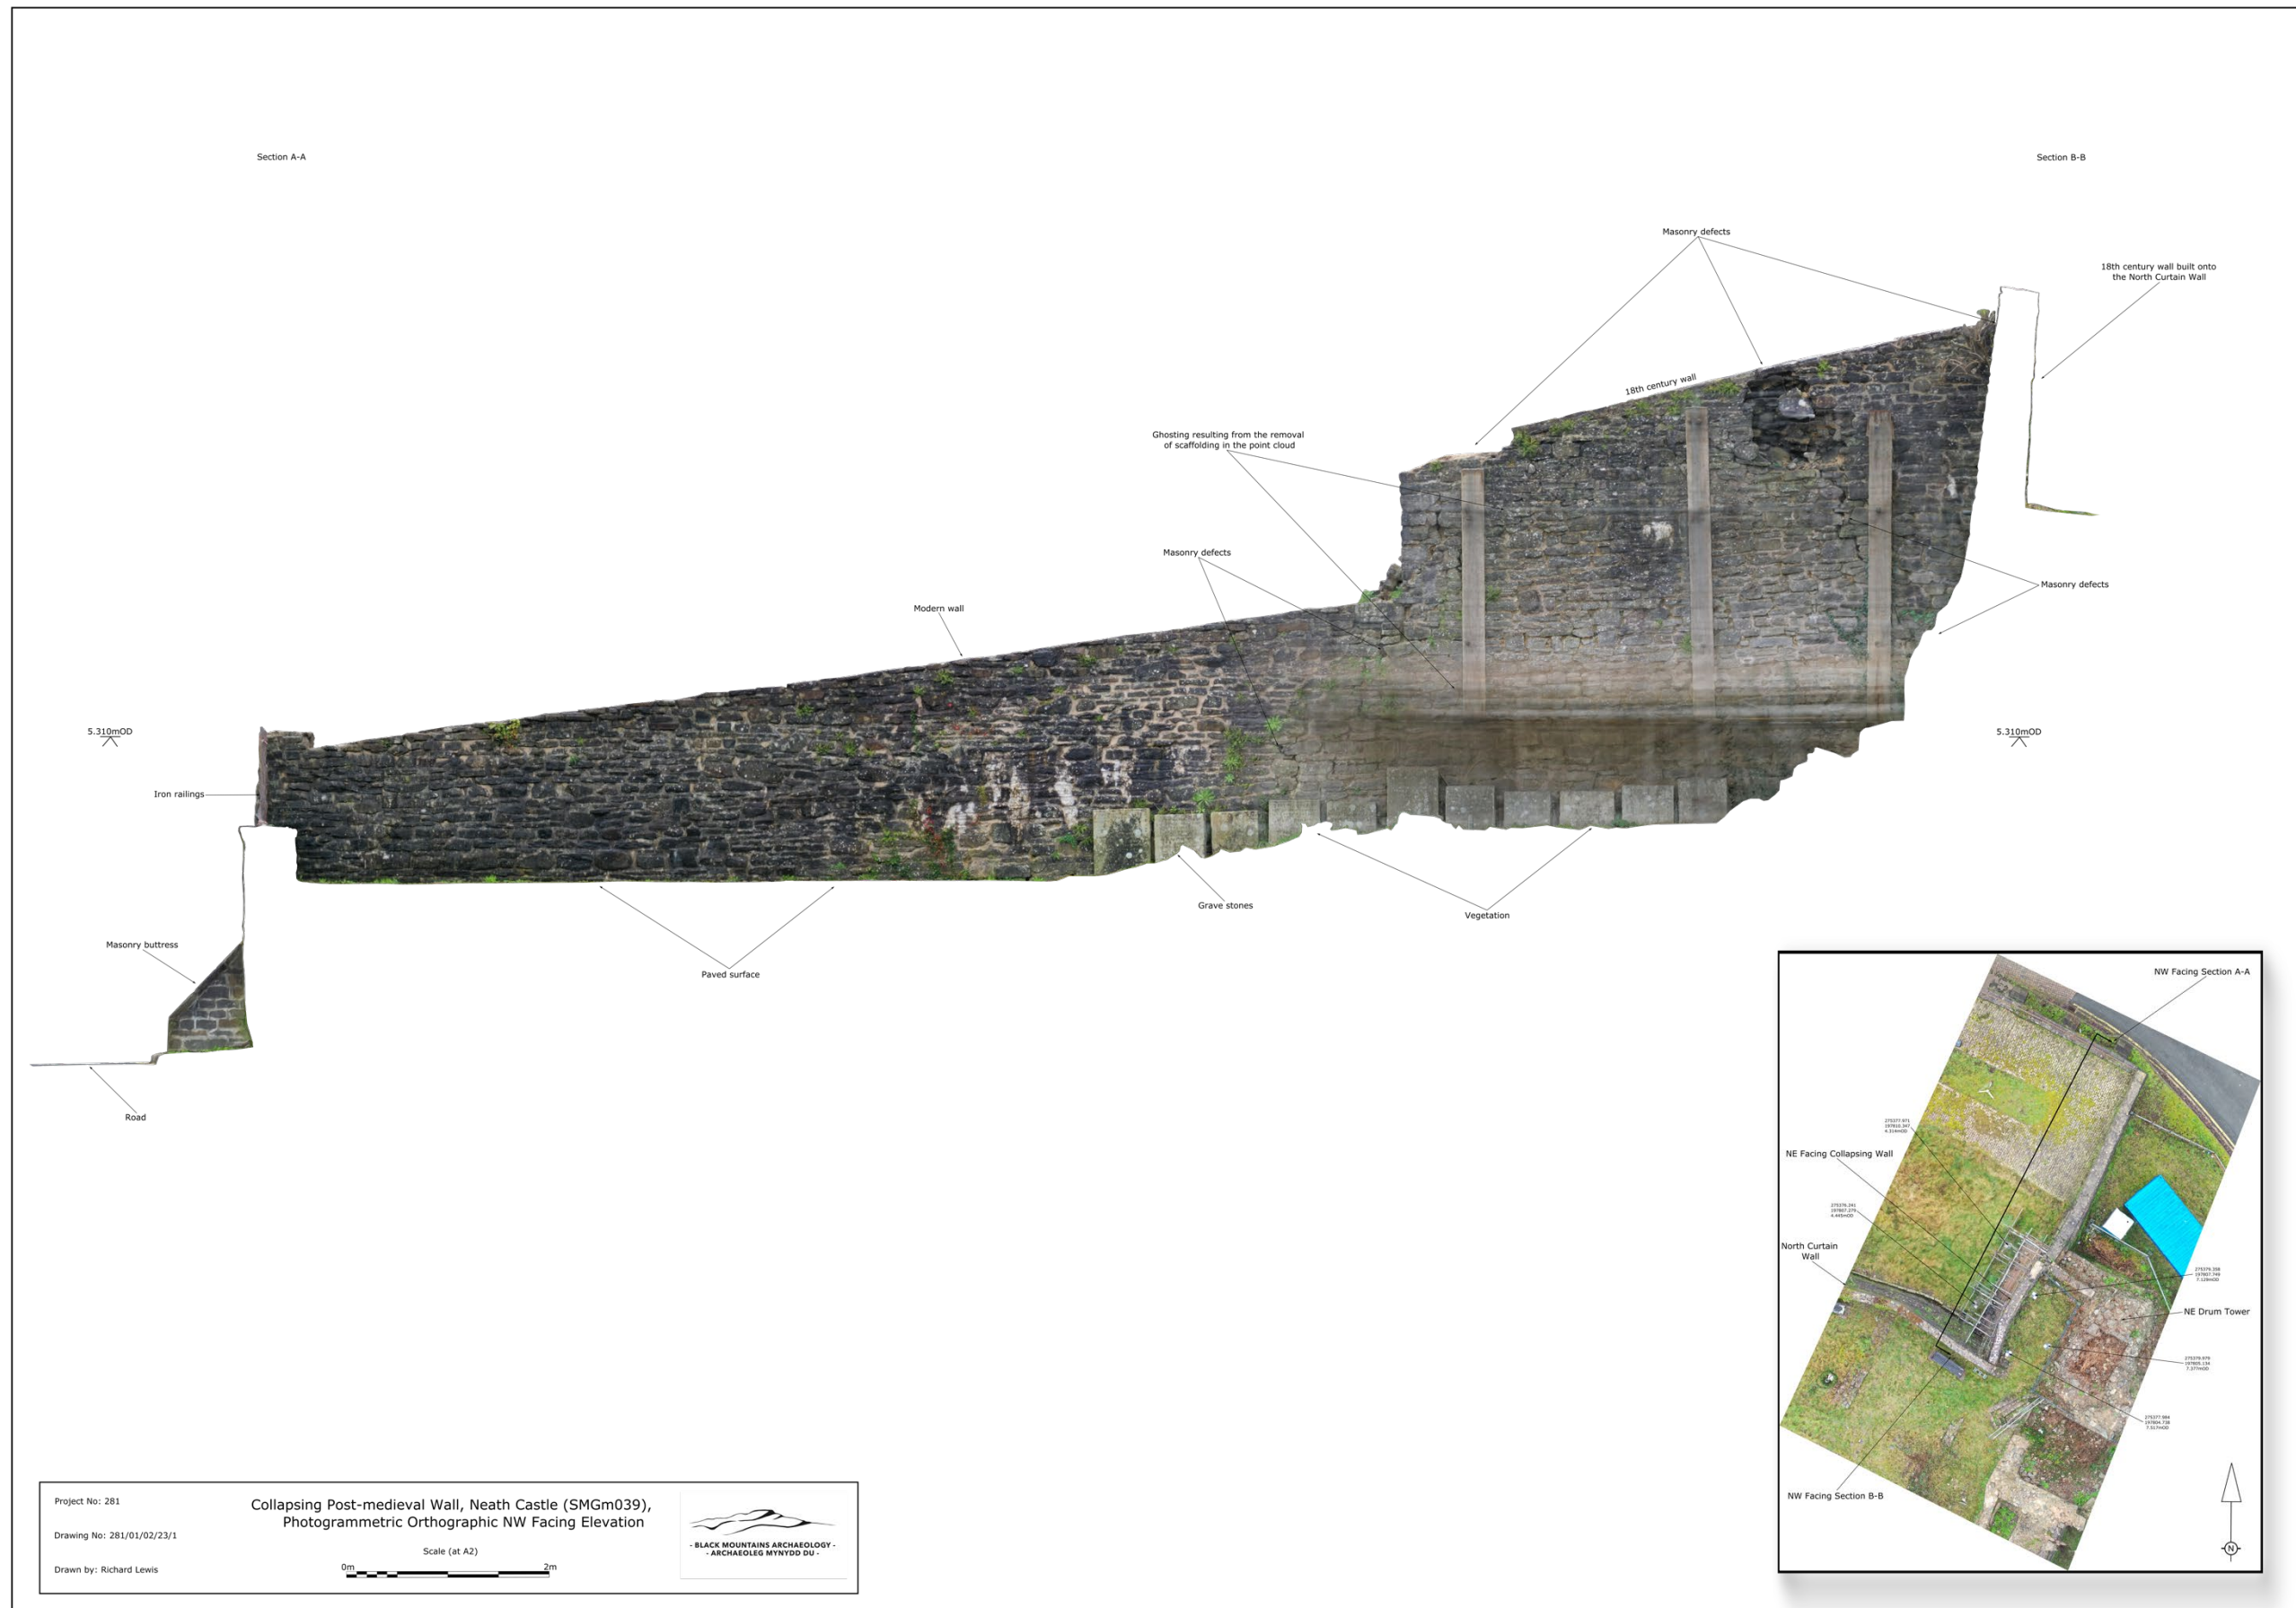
Pre-excavation/dismantling 3D photogrammetric orthographic elevation of the collapsing Post-medieval Wall, Neath Castle (SMGm039).
